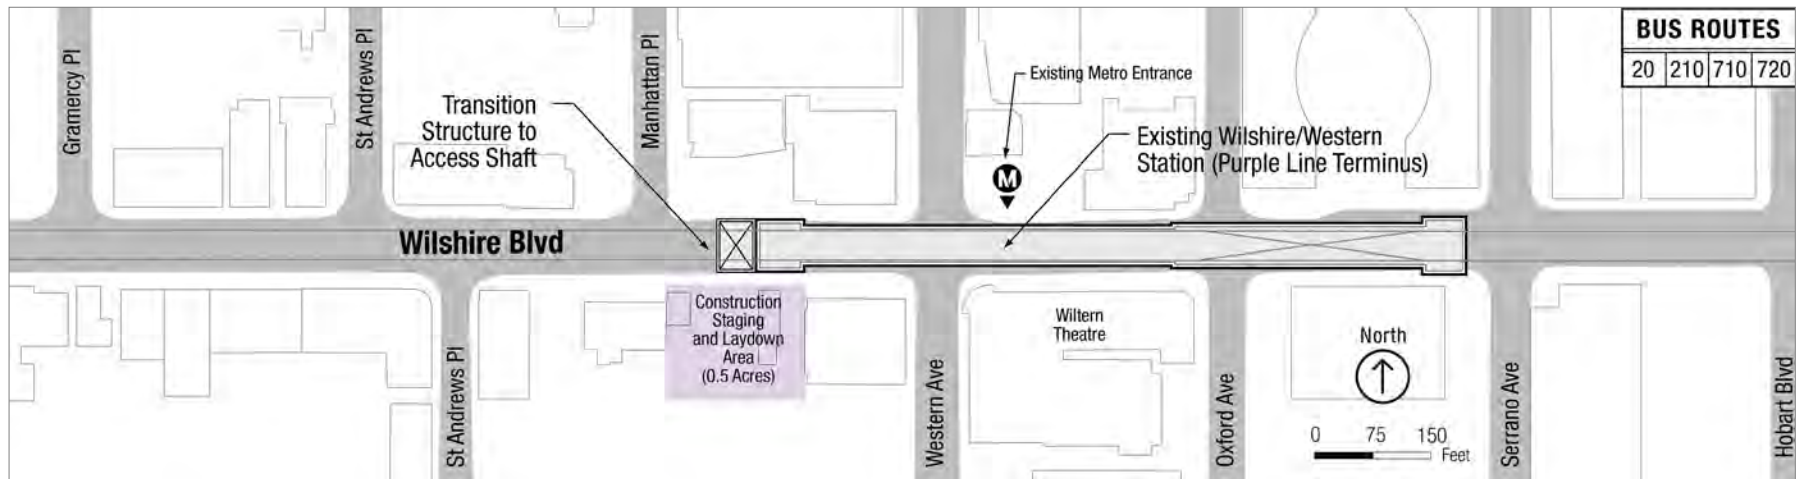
Wilshire/Western Station—Transitional Structure and Construction Staging and Laydown—South of Wilshire
